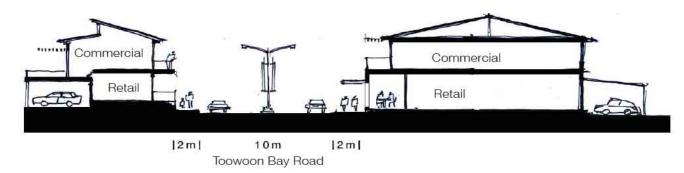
Indicative section of the Toowoon Bav Village Centre
